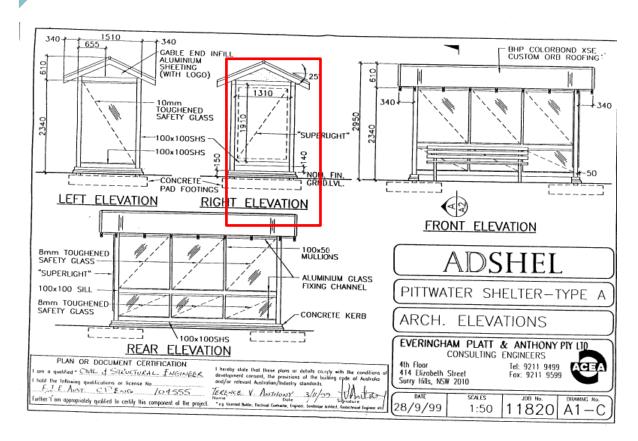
Shelter C3 DA705/00 Submitted Elevations
